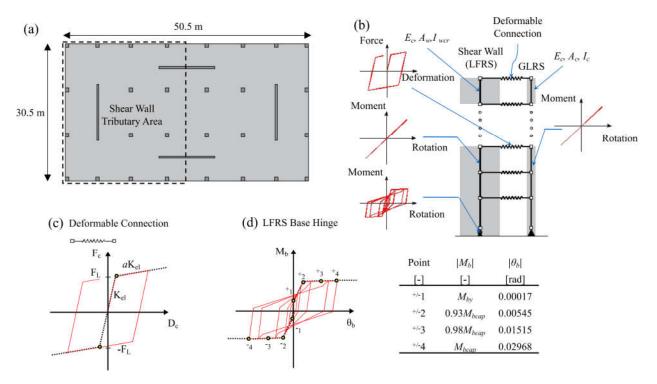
(a) Typical example building floor plan. (b) Schematic of typical example building numerical model. (c) Typical deformable connection force-deformation response. (d) Typical LFRS base hinge moment-rotation response.
